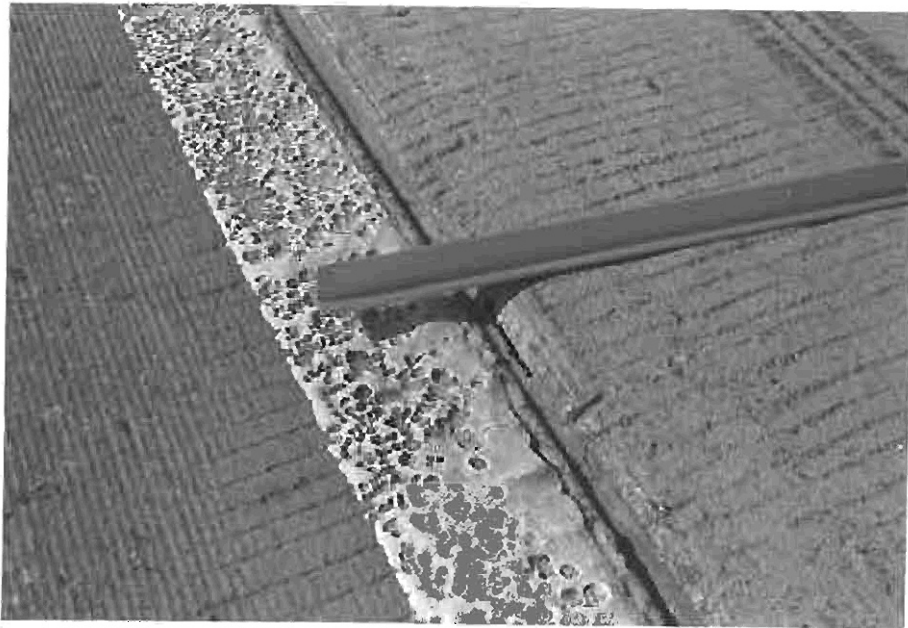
Elevation differential between the driving lane and the shoulder in the un-tied shoulder section.
